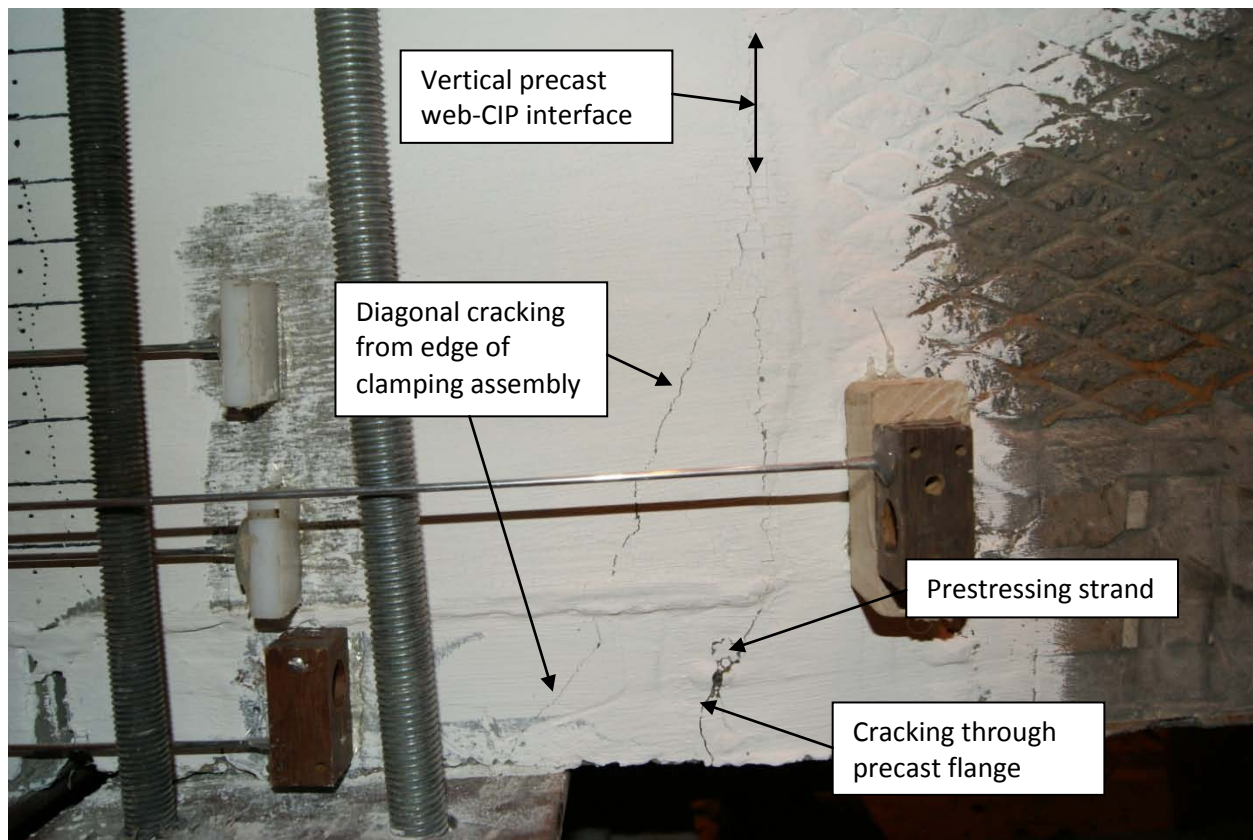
Photograph of cracking near the vertical precast web-CIP interface, including cracking through the precast flange and diagonal cracking due to the clamping assembly in SSMBLG6-Frosch
